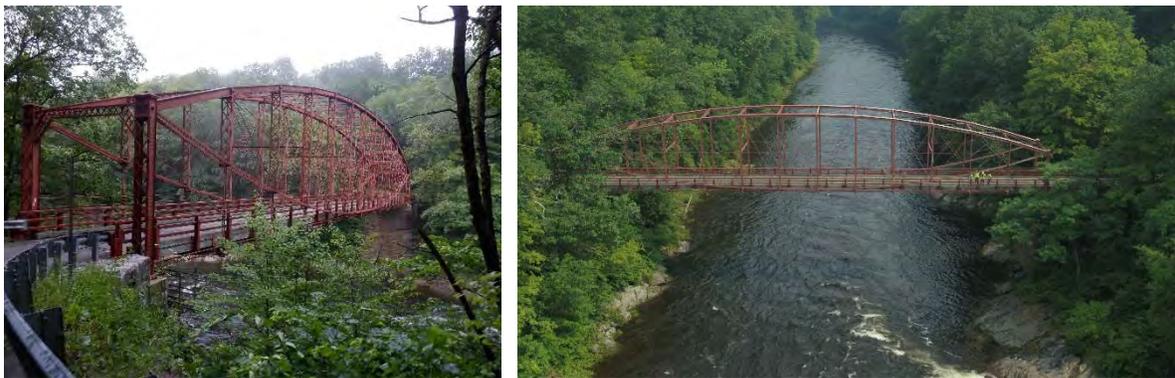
Terrestrial versus Aerial Elevation of Truss Bridge
